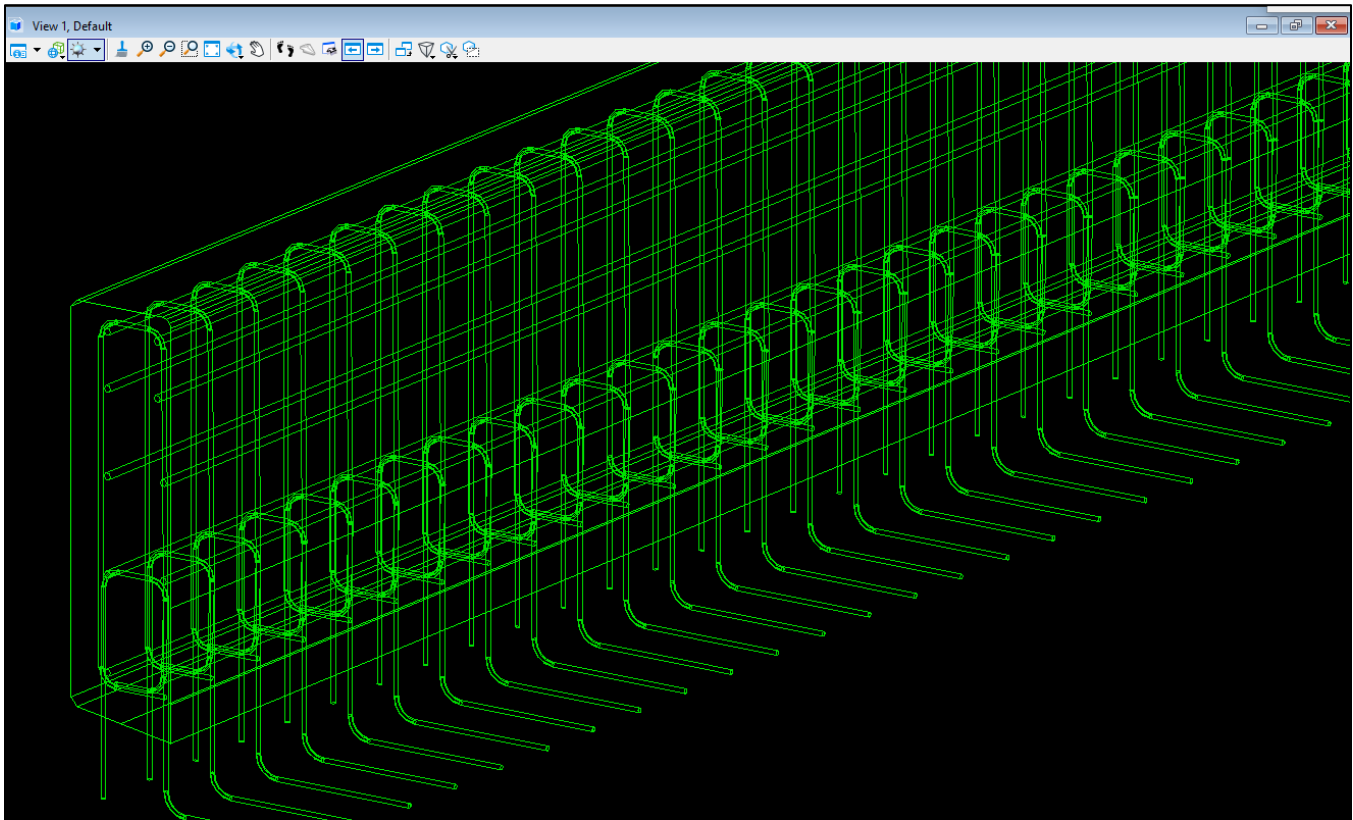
Fully Detailed 42" Vertical Wall Barrier Reinforcement
